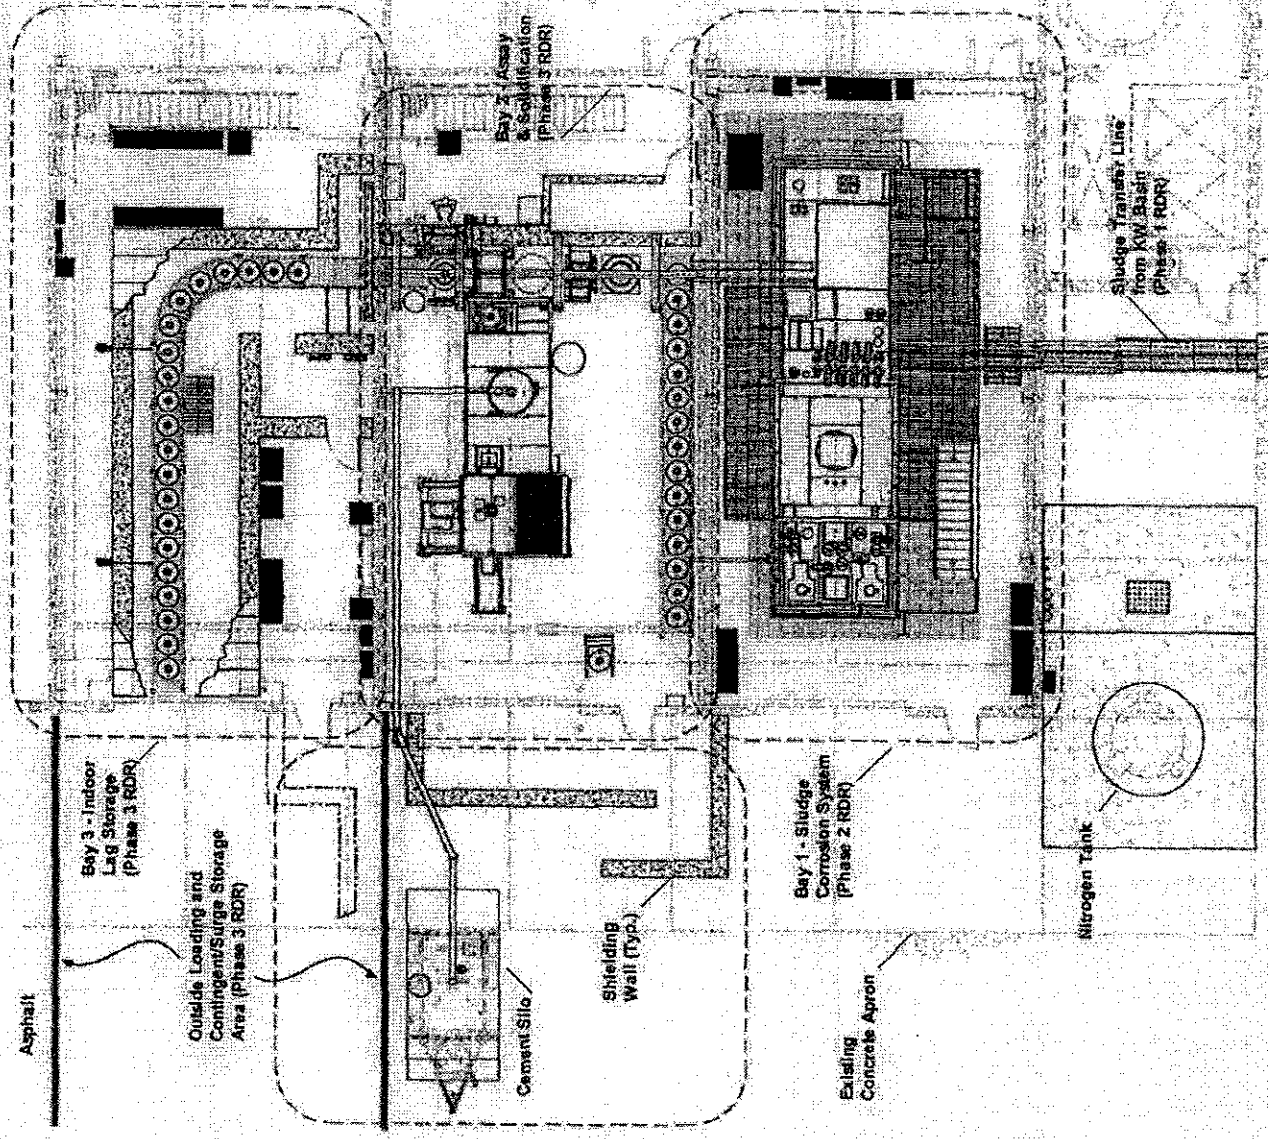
Sludge Stabilization and Packaging System – Floor Plan
